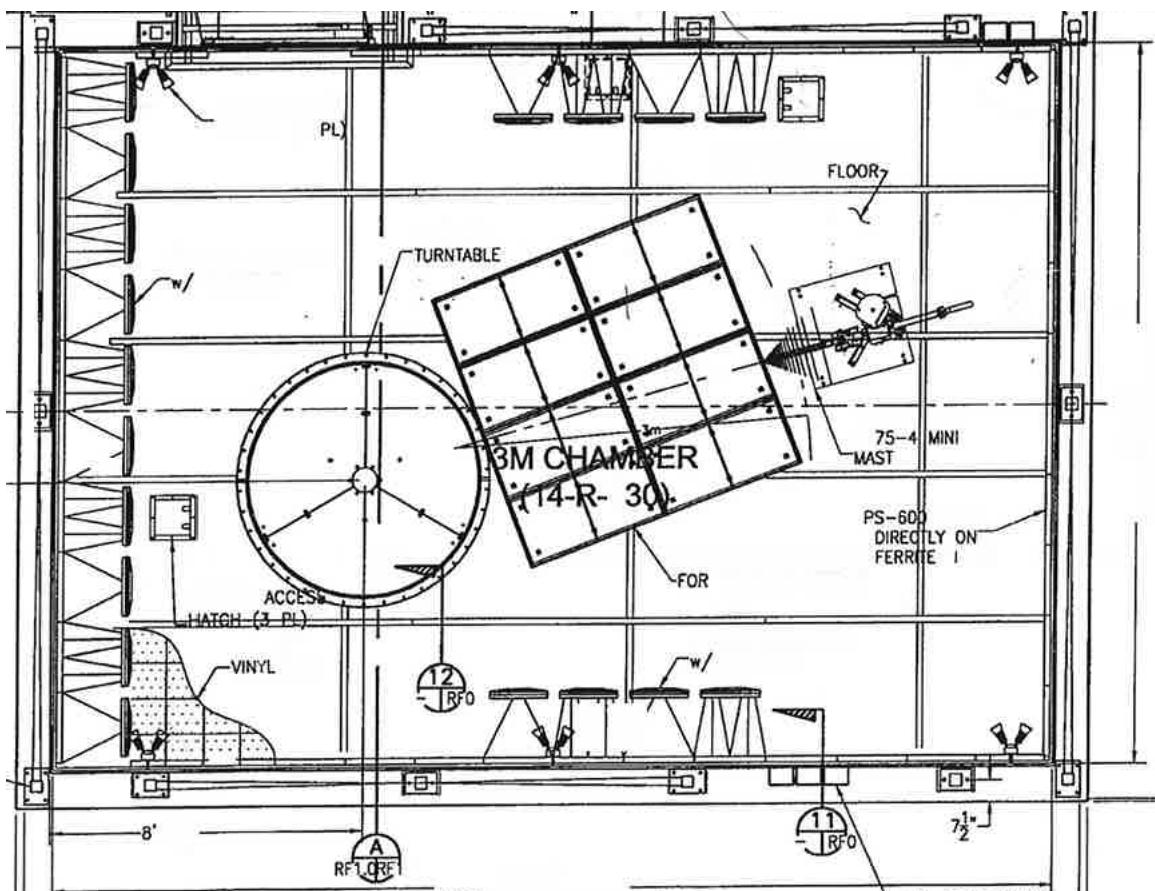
Semi-Anechoic Chamber Test Site (Alpharetta Facility)
